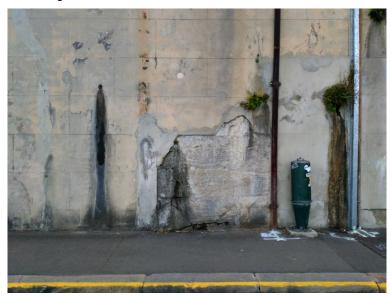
State heritage listed item Dalgety's Bond Store located outside of the study area
